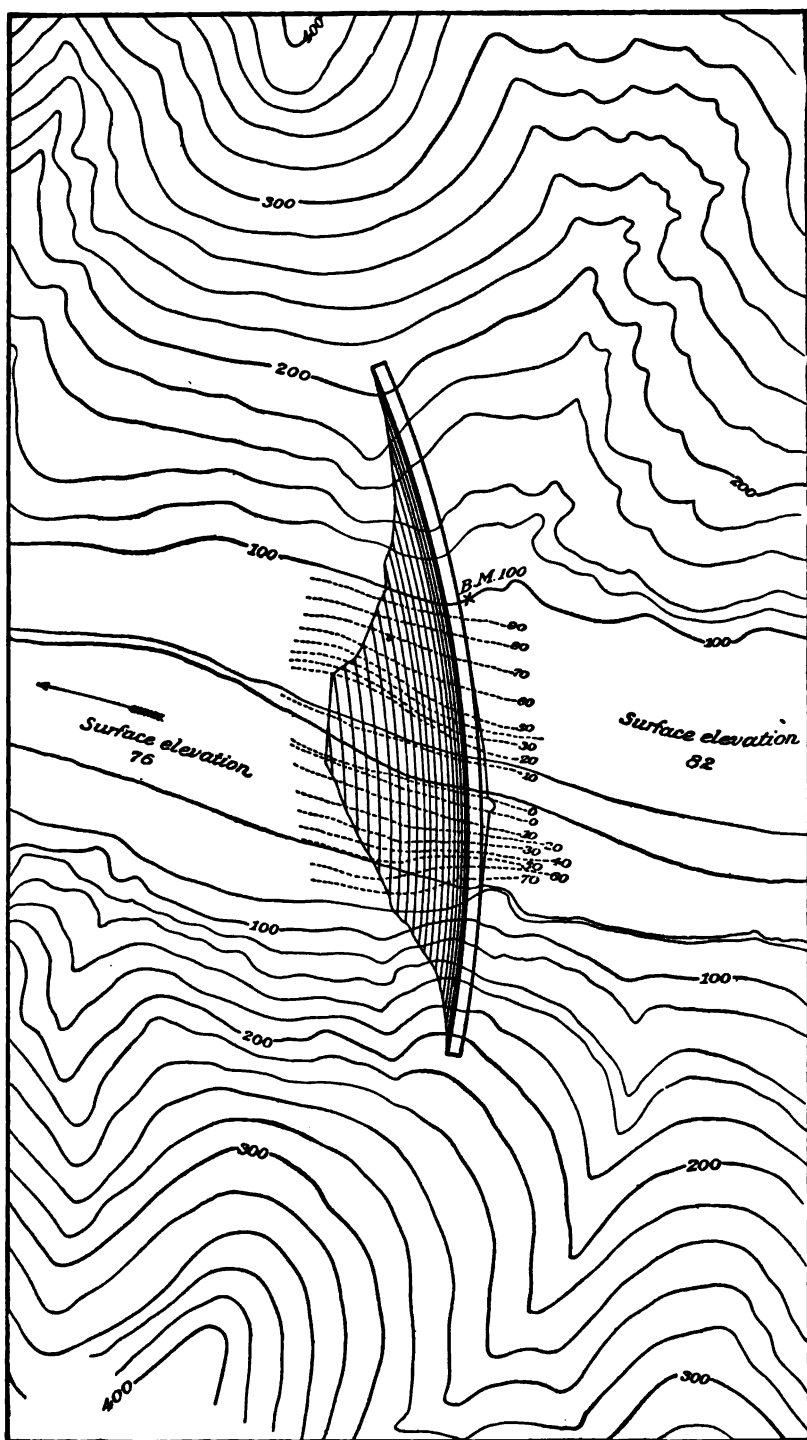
PLAN OF RIVERSIDE DAM-SITE, GILA RIVER, ARIZONA, SHOWING LOCATION SELECTED FOR A PROPOSED MASONRY DAM.
